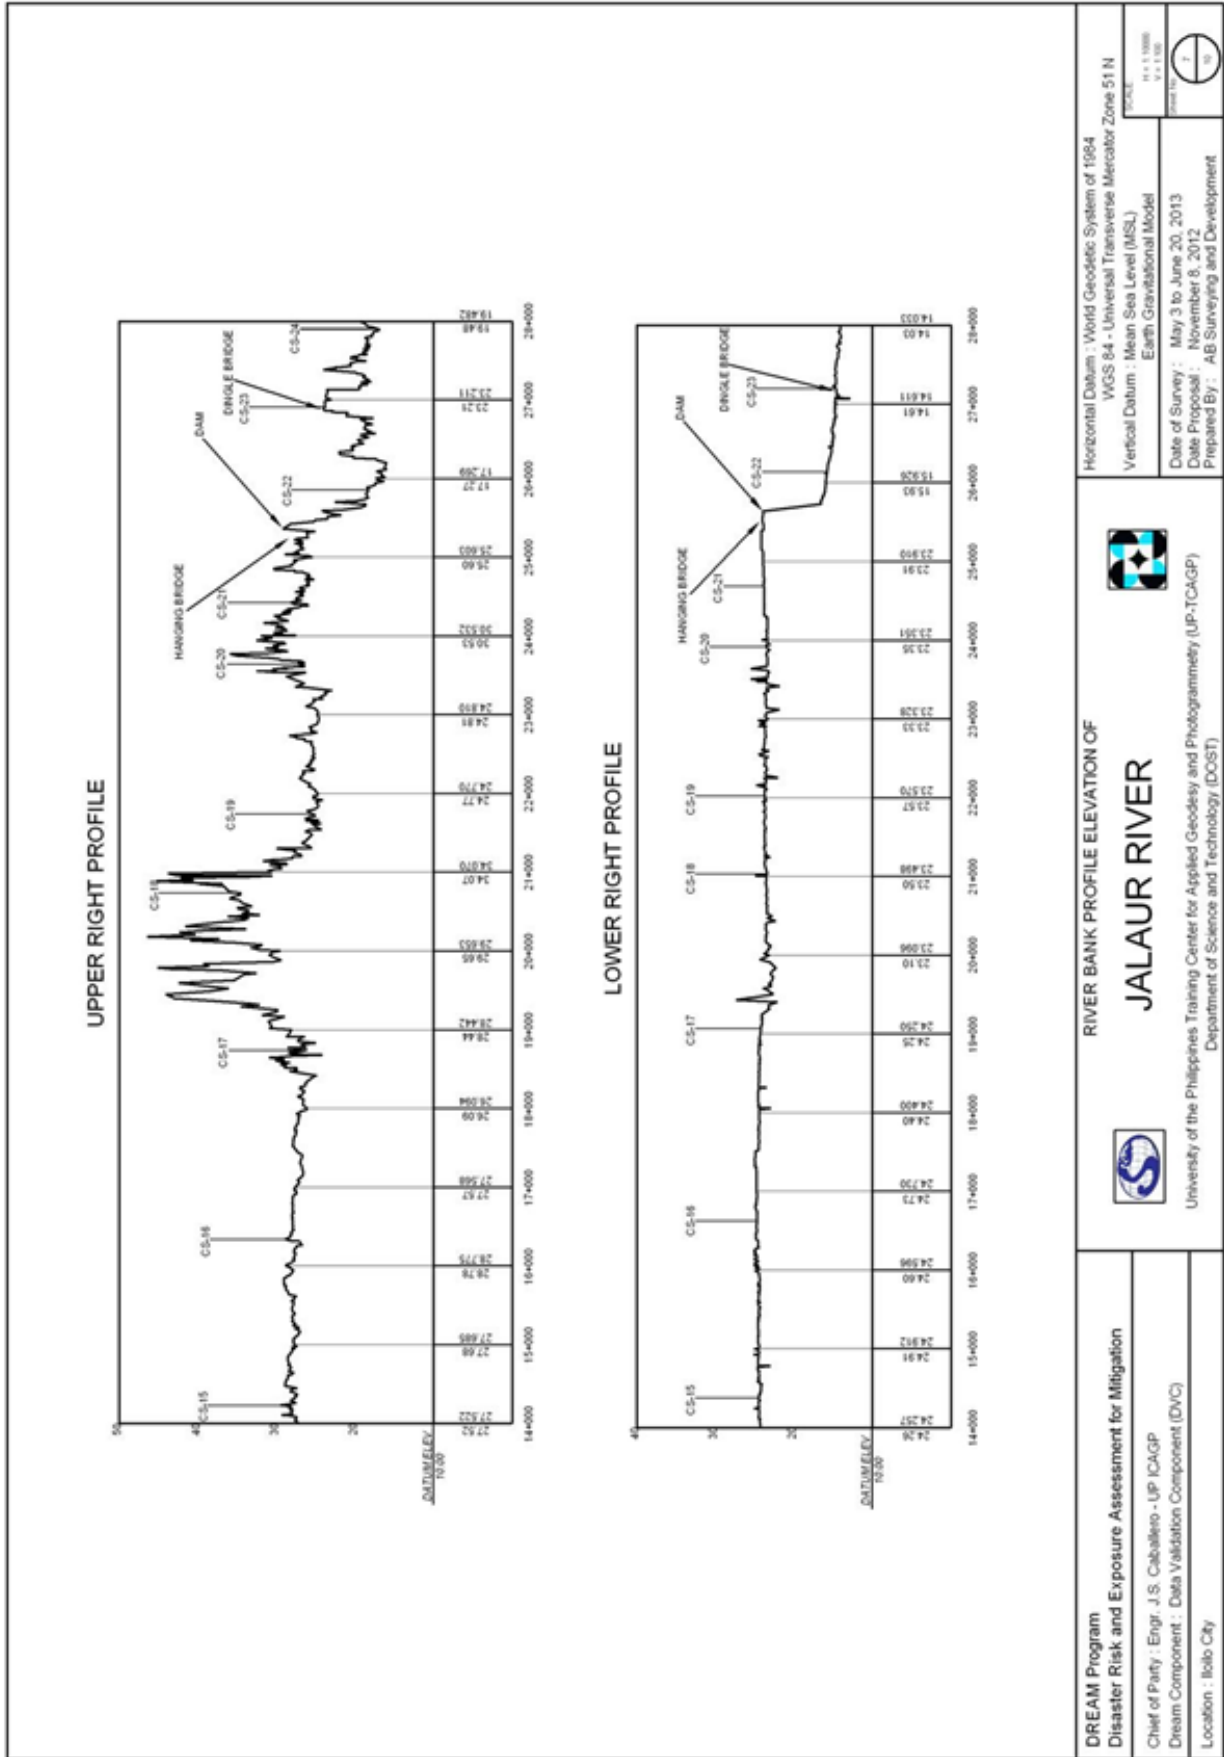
Sheet No. 7 Right River bank profile with relative location of bridge and cross-section
